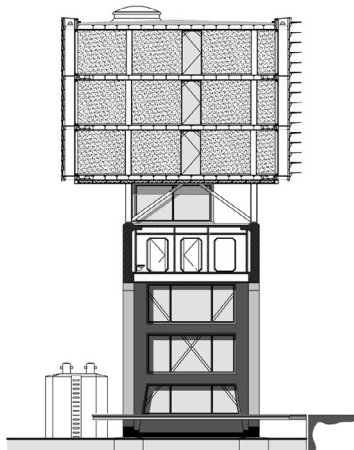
Section through Kraanspoor building (Archdaily, 2008). 2008.
